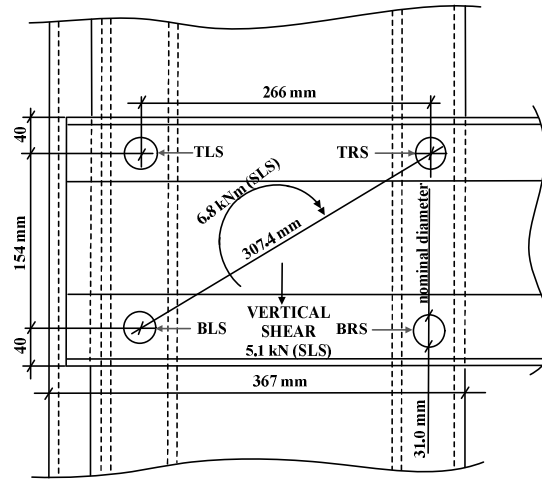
SPJ connections and joint actions from the most severe SLS load case.
